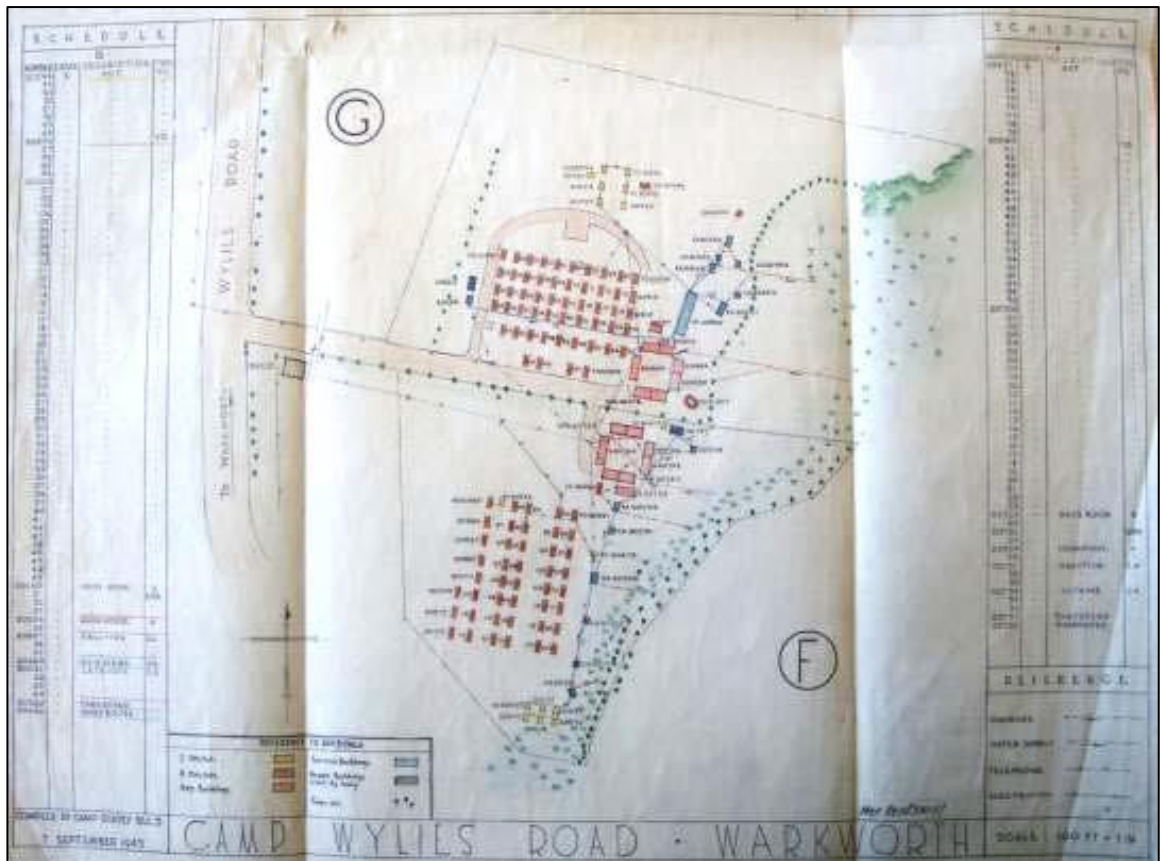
Plan detailing the layout of Wylies Road Camps F and G, situated along Wylie Road (source: Archives New Zealand, ACIO 8722 6/ 75)
